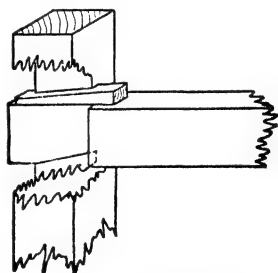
Dovetail Tenon: face-over tenon removed to show arrangement.
